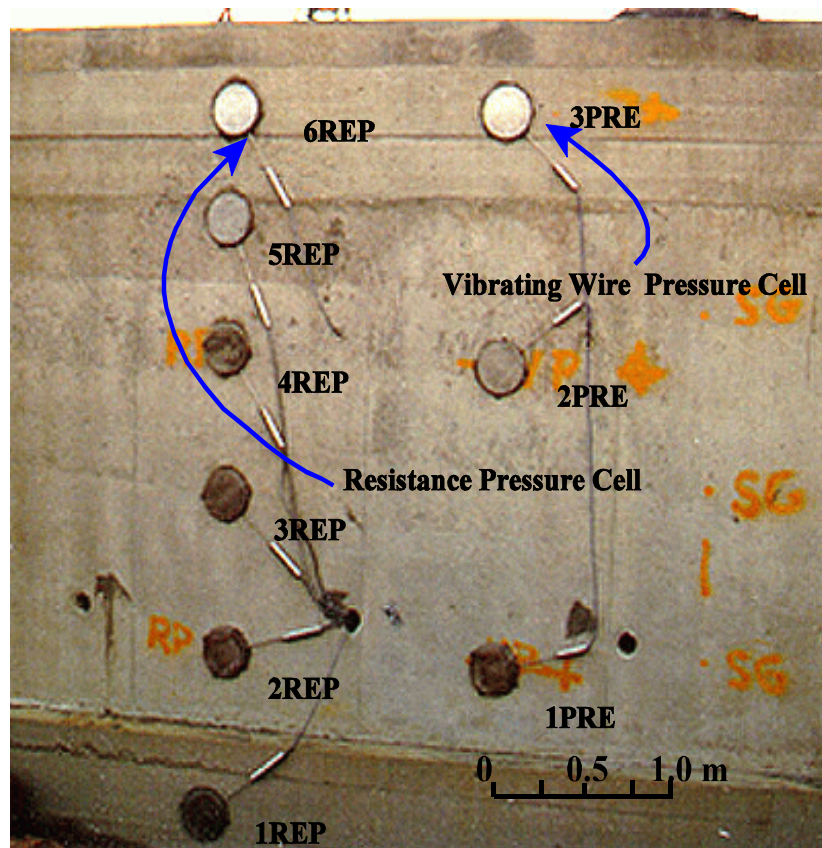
2 Photograph of Culvert Wall (Greene Co., TN)
